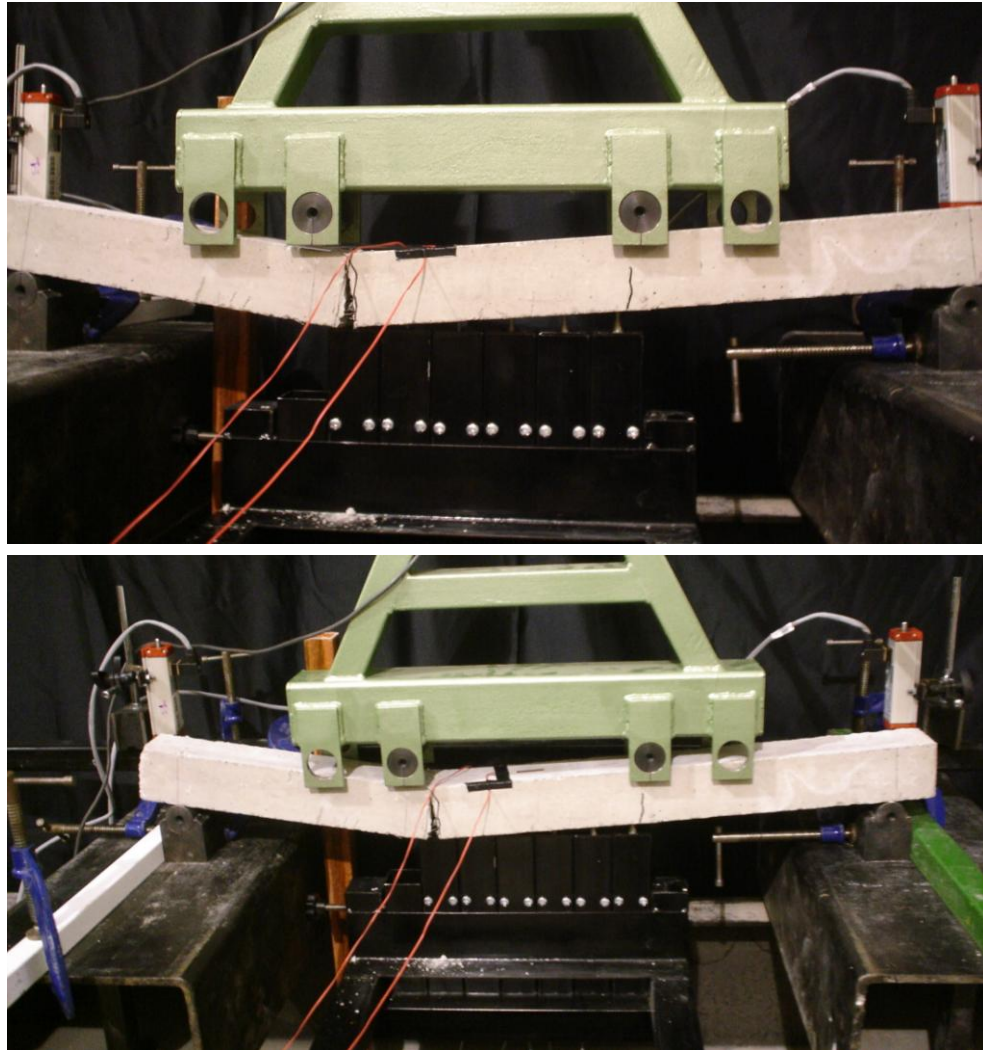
Cracking pattern of steel fiber reinforced concrete flexural element (*sfrc*)
